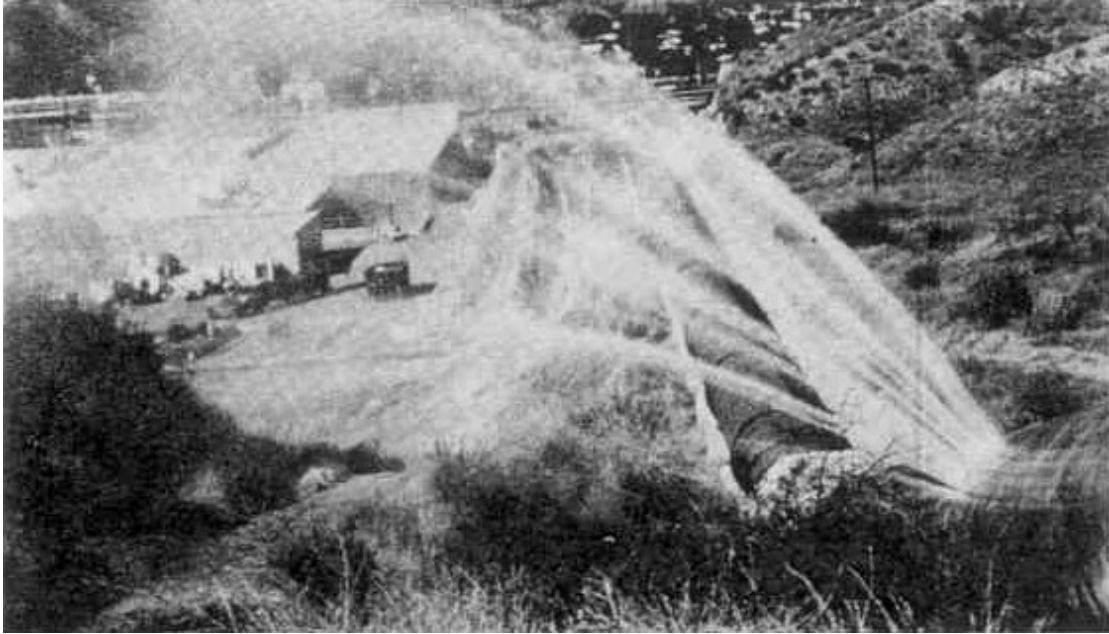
Photo Showing Pipe Leak in a 3050-mm-Diameter Welded Steel Pipe
